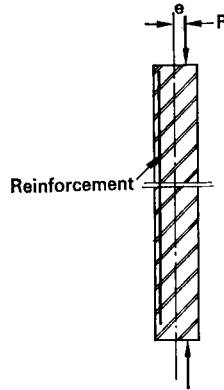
Reinforced brickwork wall with vertical reinforcement.
